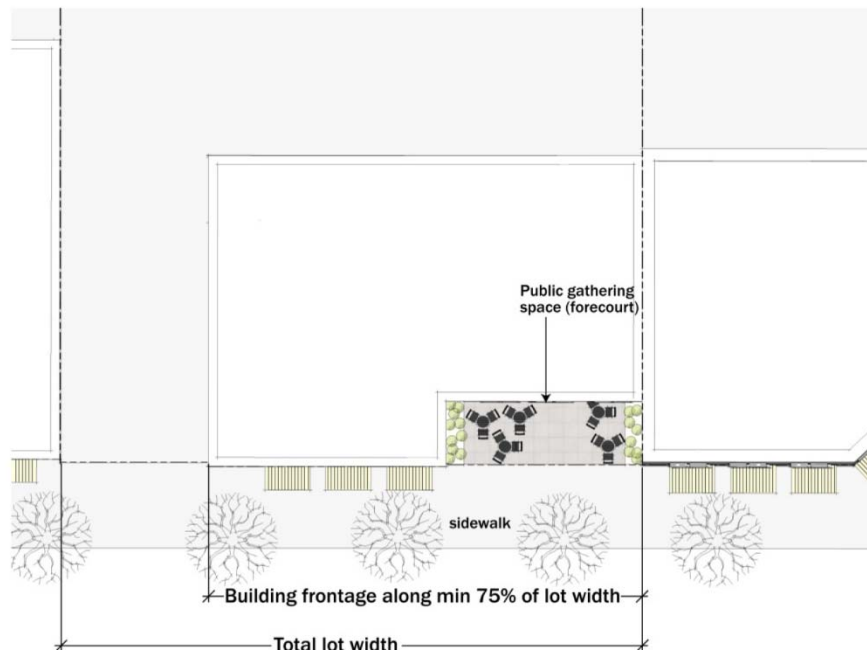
REQUIRED BUILDING FRONTAGE ALONG COMMERCIAL STREET AND PRINGLE CREEK
